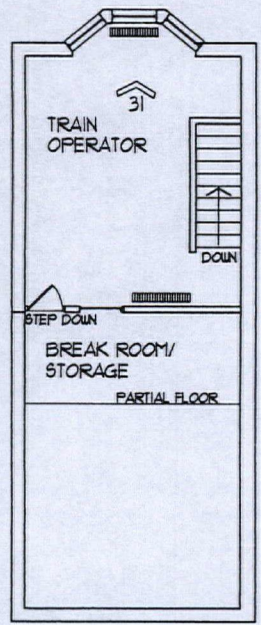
PHOTO KEY, INTERIOR - SECOND FLOOR PLAN
